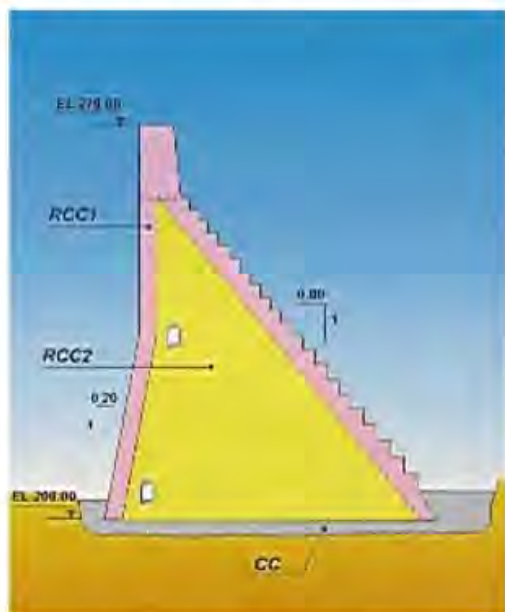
Concrete zoning diagram at Spanish RCC dams (from [4.21])
